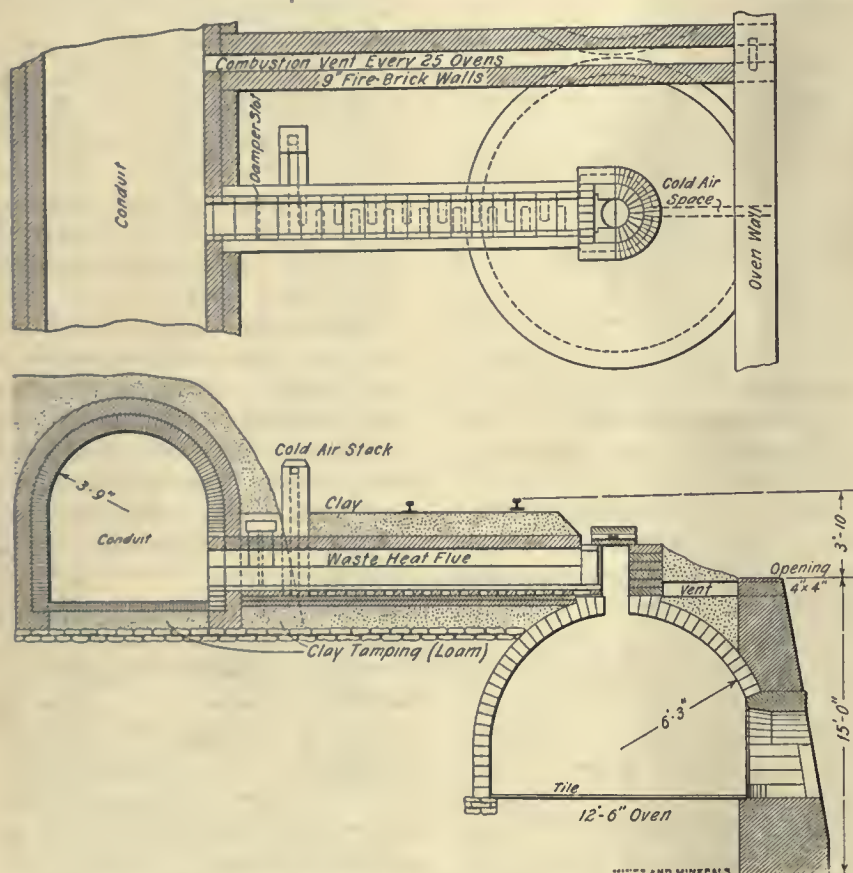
PLAN AND SECTION OF COKE OVENS AND WASTE-HEAT CONNECTIONS
